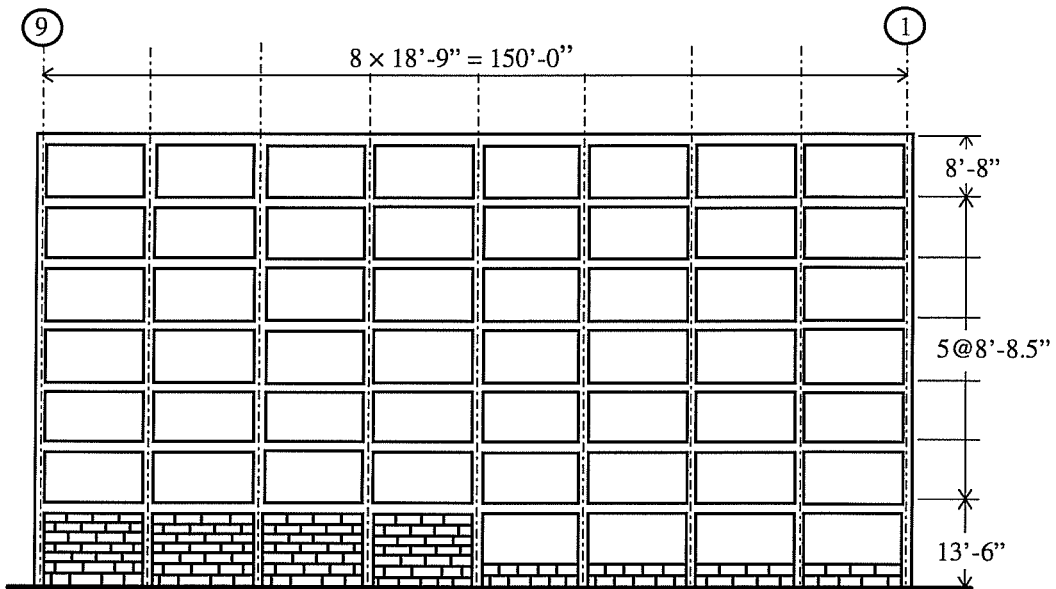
Seven-Story Hotel North Perimeter Frame Elevation
